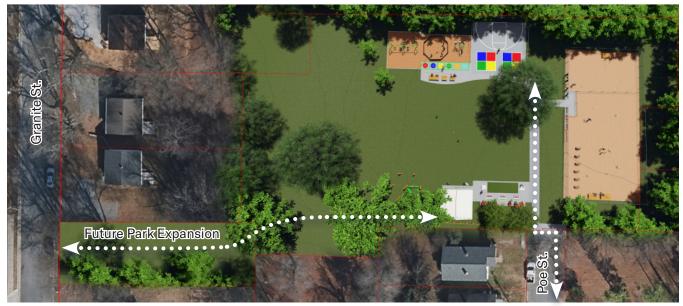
Plan showing location of future park land addition and proposed accessible sidewalk connections at both Granite Street and Poe Street.
